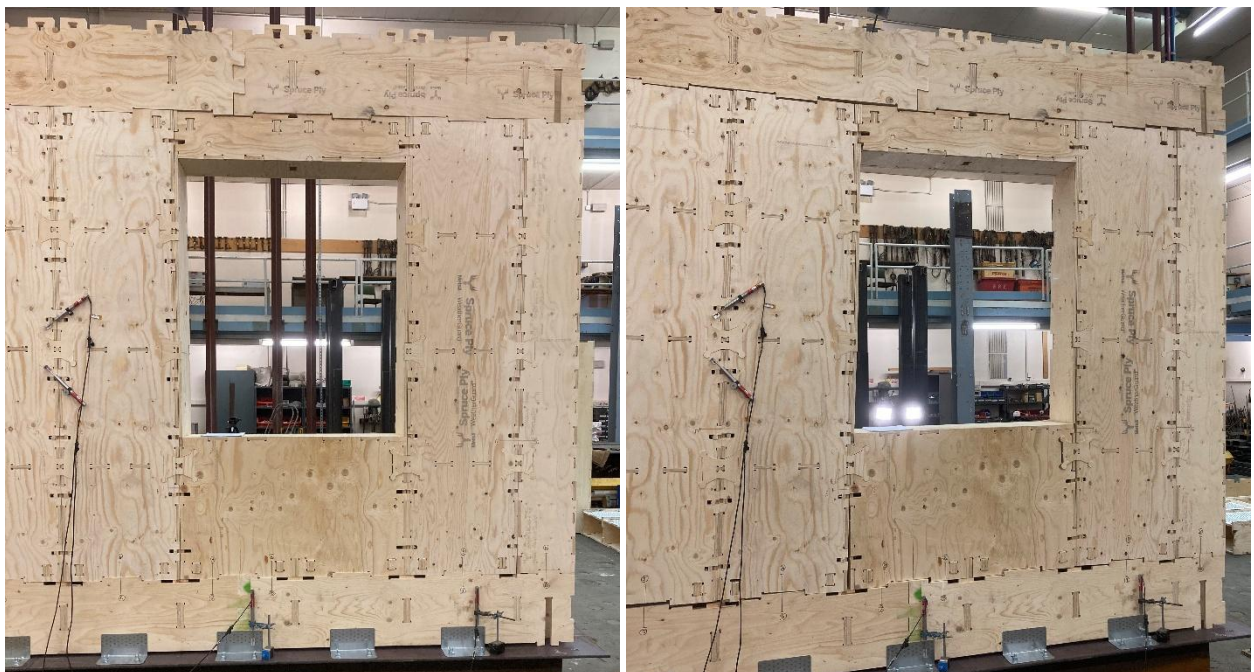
RHS of Window Wall without Vertical Load Before (L) and After (R) Test
